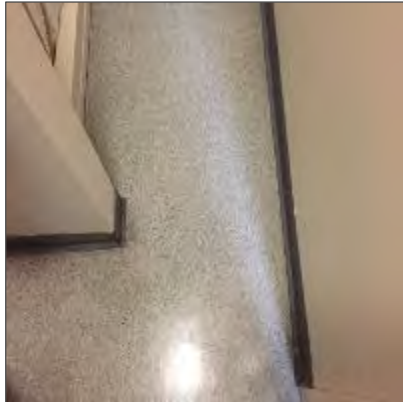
Non-asbestos vinyl sheet flooring, light grey pebble pattern, Level 1 Washroom.
